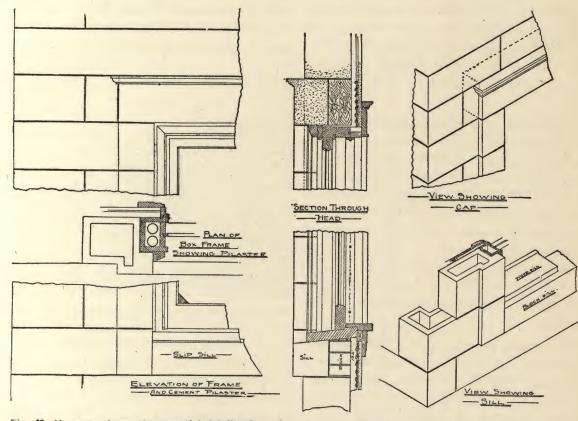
Here are shown the essential details of wood work around the window frames in connection with concrete blocks.
